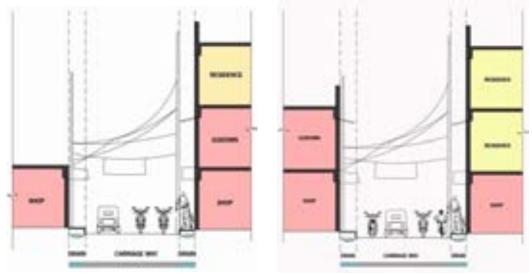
Bada Bazaar Street (Section - 1) (left) Shyamganj Market Street (section 2) (right)
